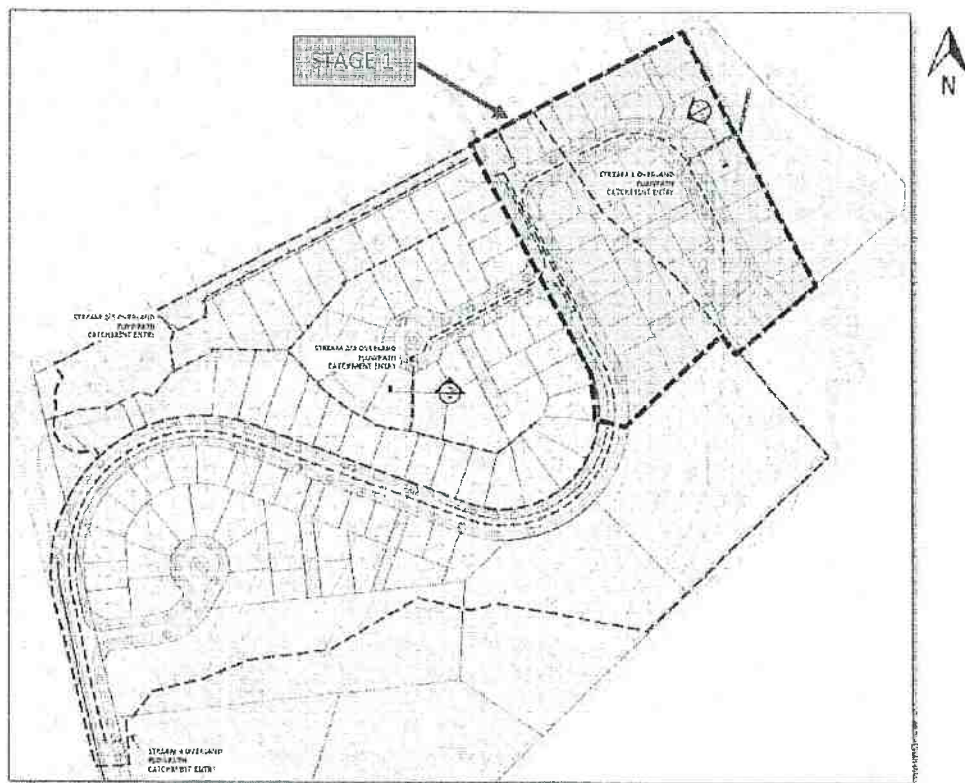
162 – 166 Settlement Road Subdivision – Stage 1
